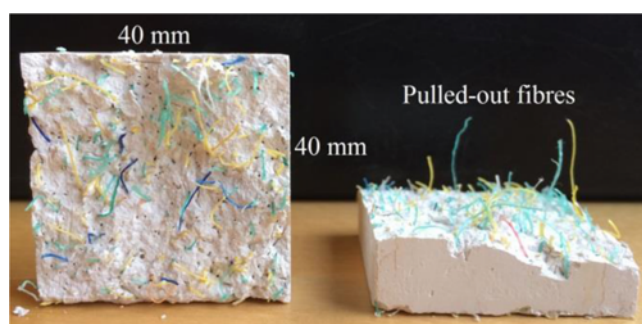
Fracture surface of prismatic specimens with 2.0 wt% of cleaned R-PE fibres after three-point flexural bending test.
